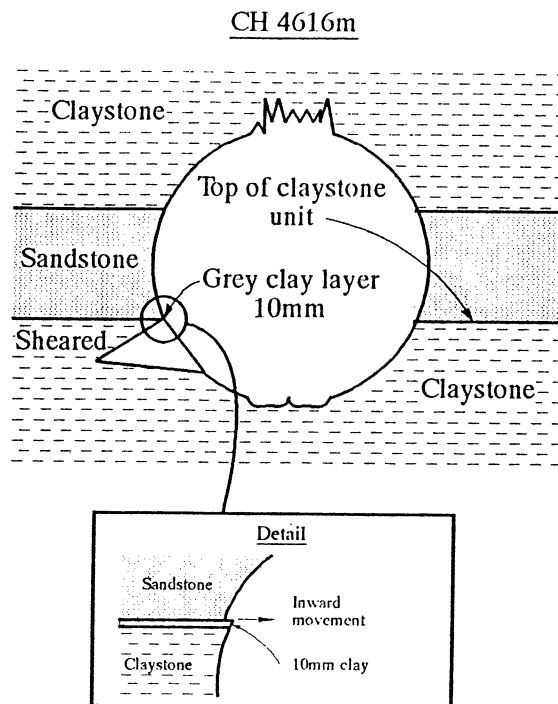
Typical Stress/Structural Failure Along Malabar Outfall
